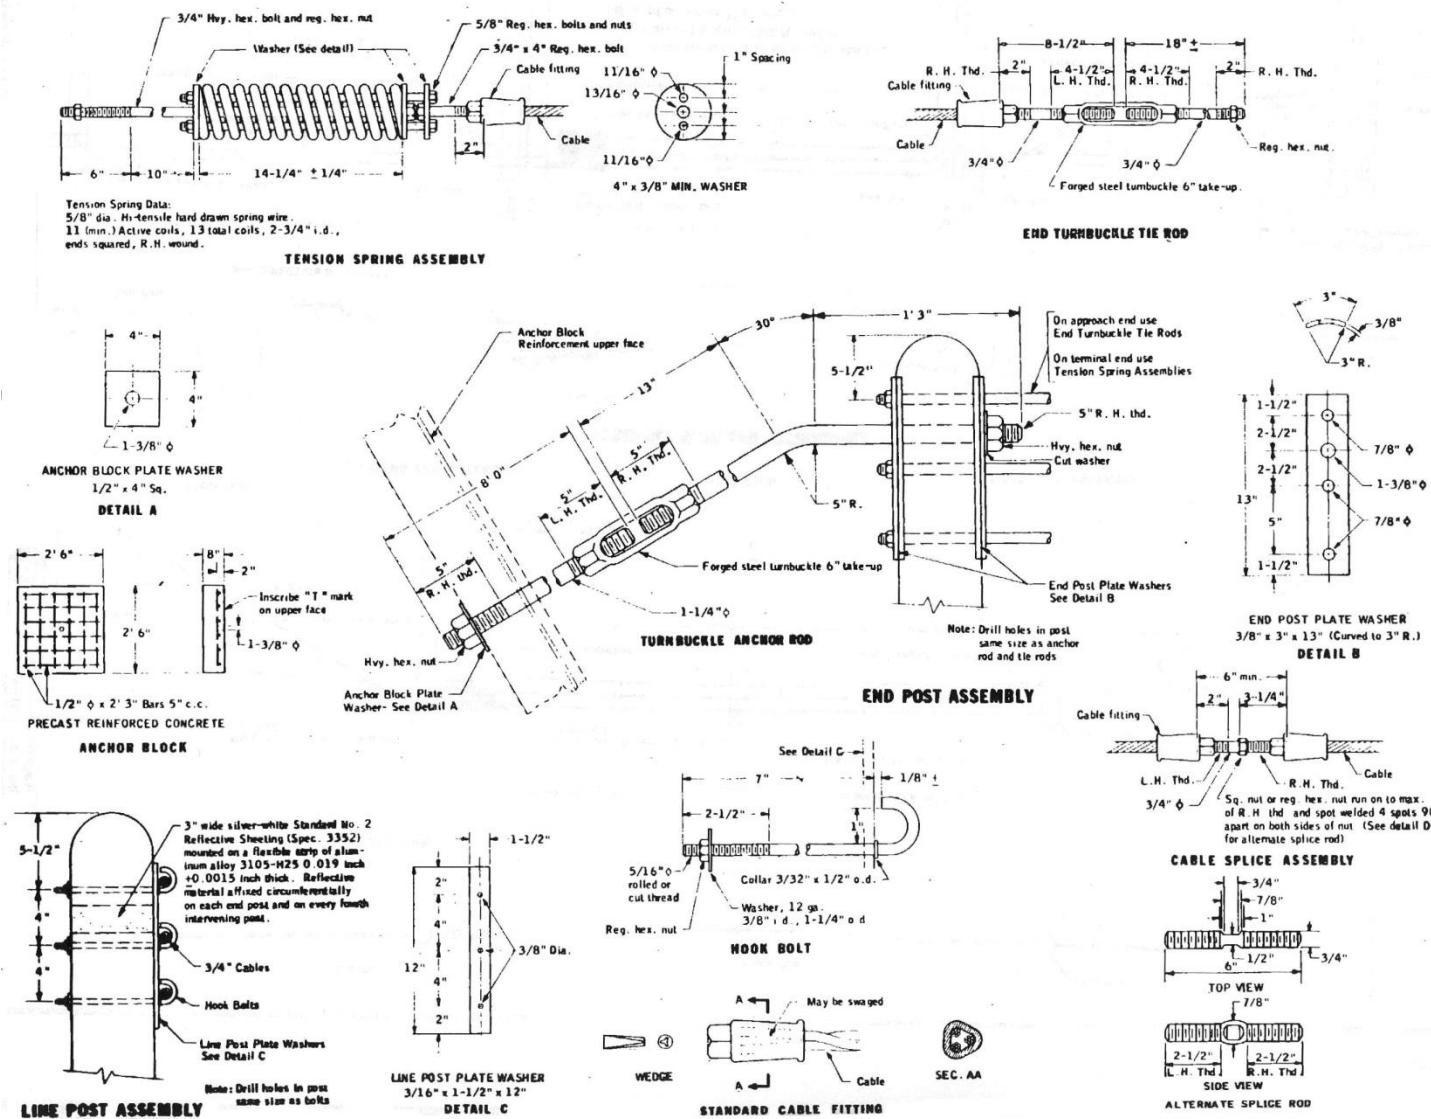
System Details, End-On Test of Cable Guardrail, 1974 [16]
